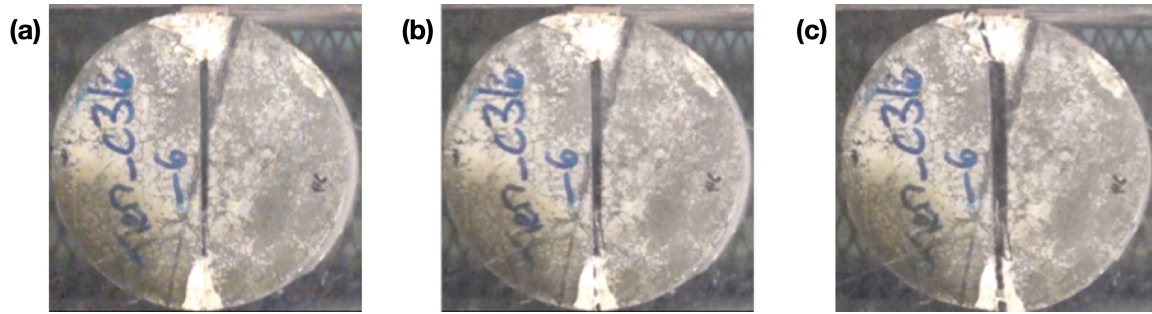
Repaired concrete tension behavior at interface: (a) before failure, (b) crack initiation, and (c) at failure.
